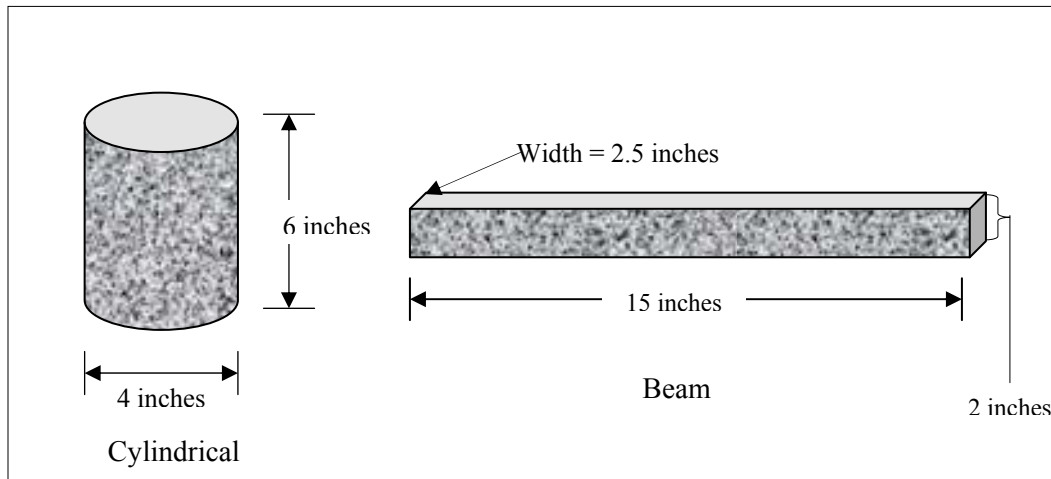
Laboratory Test Specimens (Drawing not to Scale).
